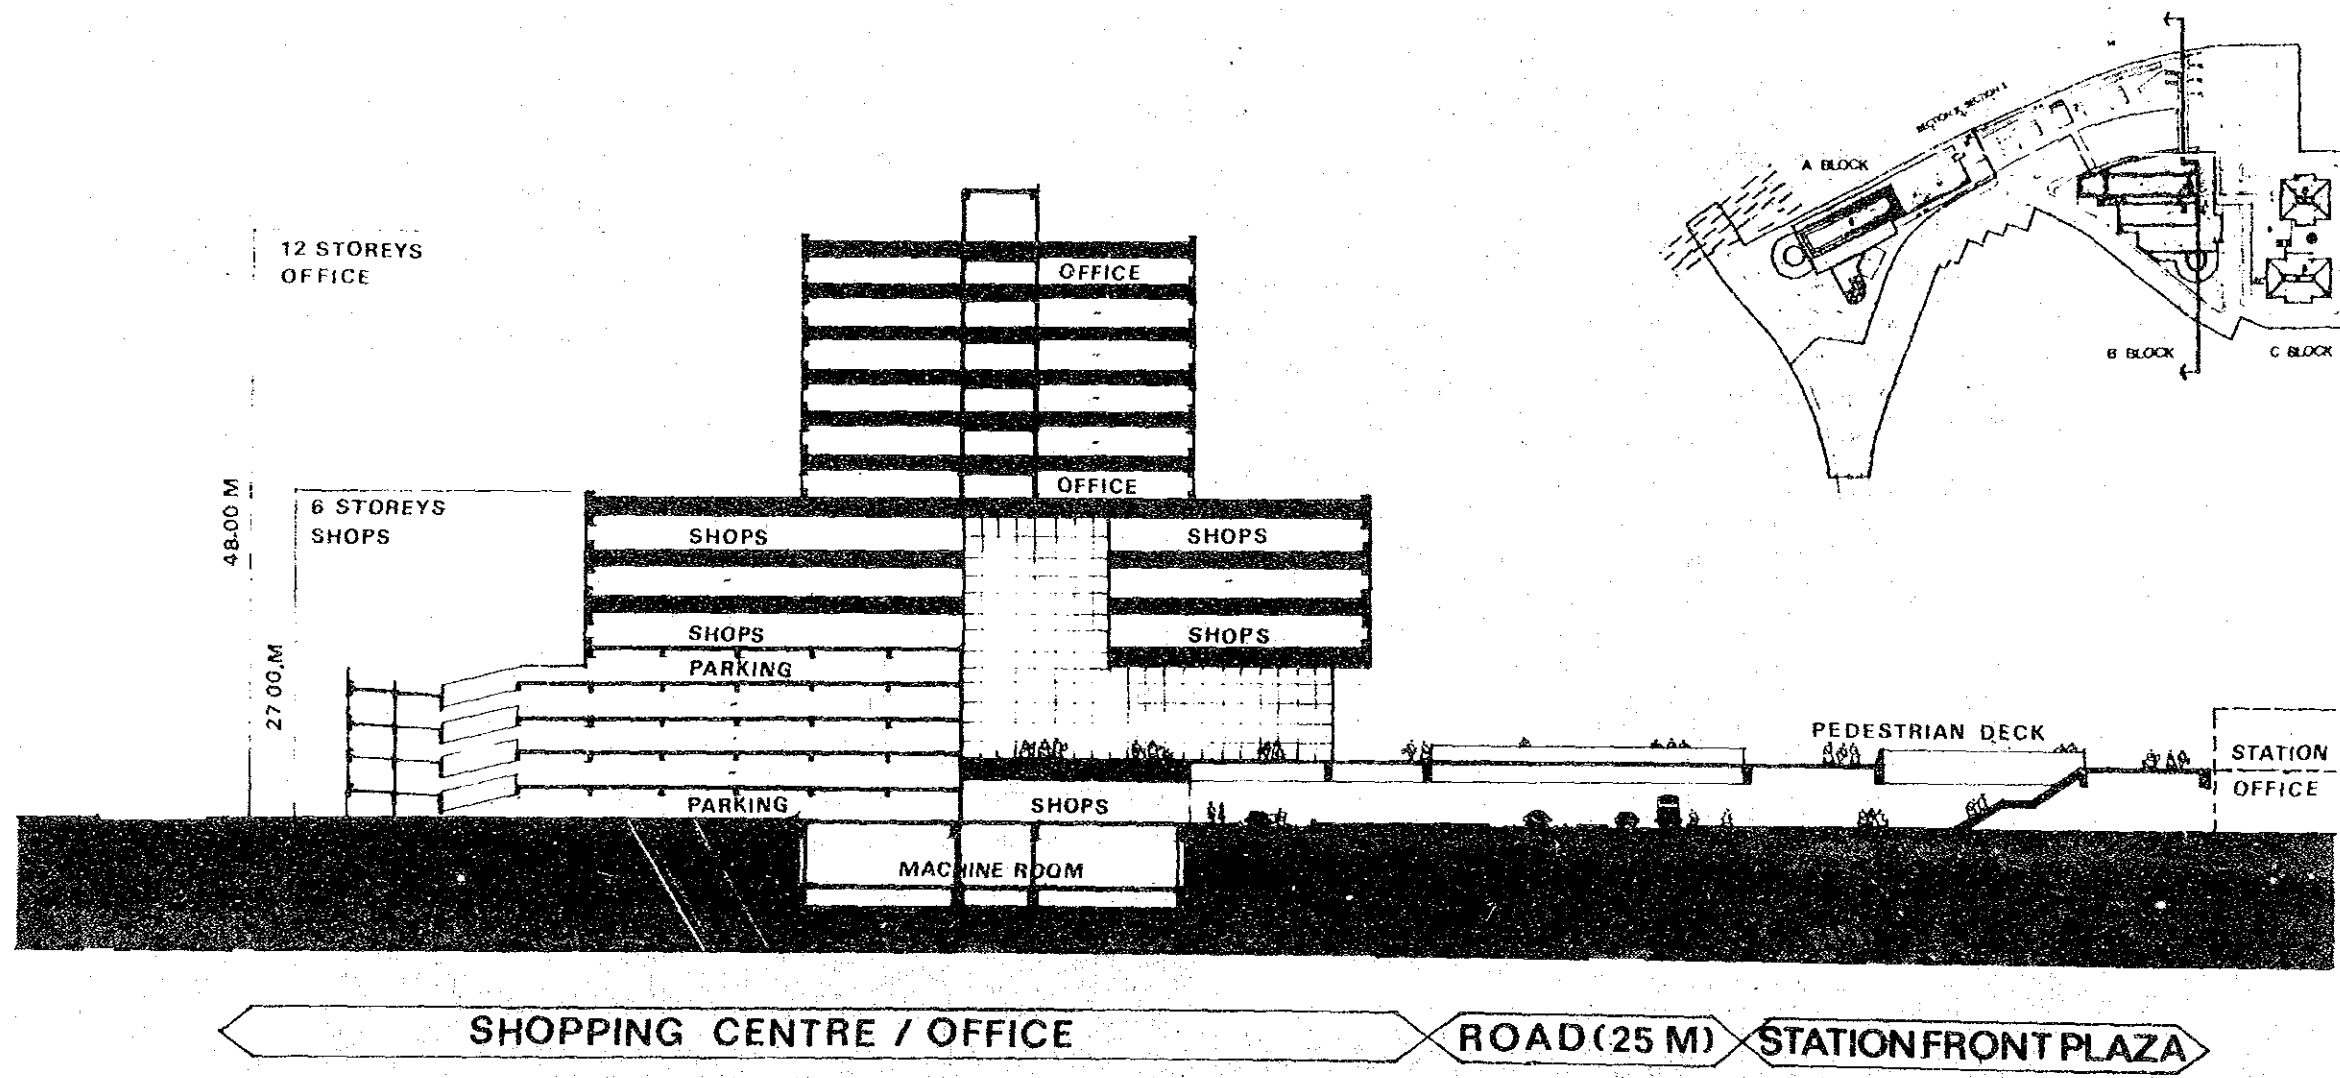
SECTION OF BLOCK B - MANGGARAI
